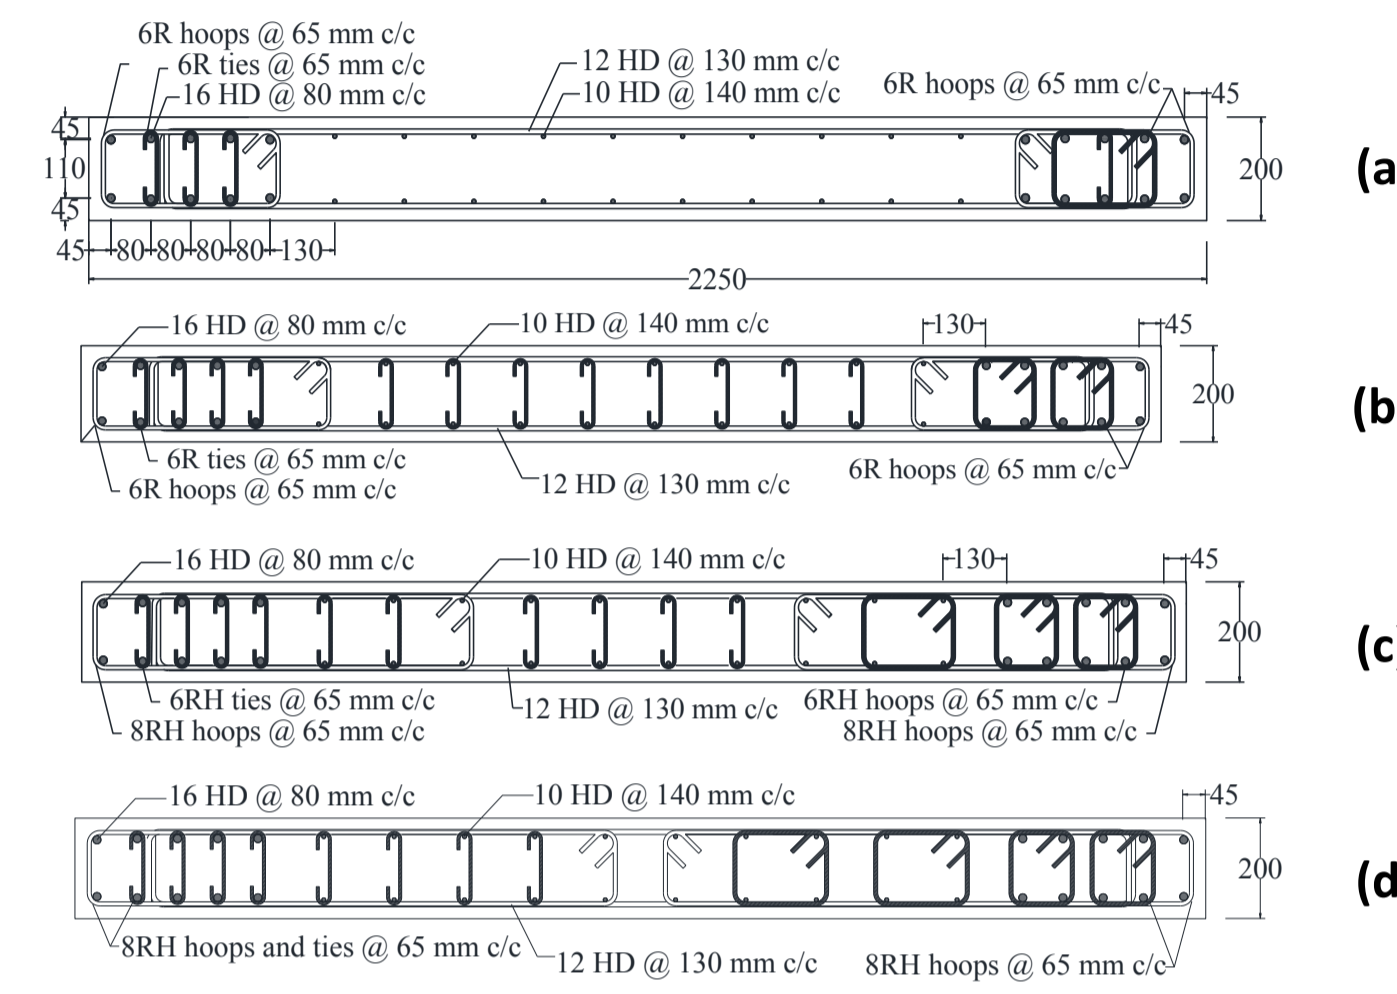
Test wall cross-sections (a) C10 (b) A10 (c) A14 and (d) A20
